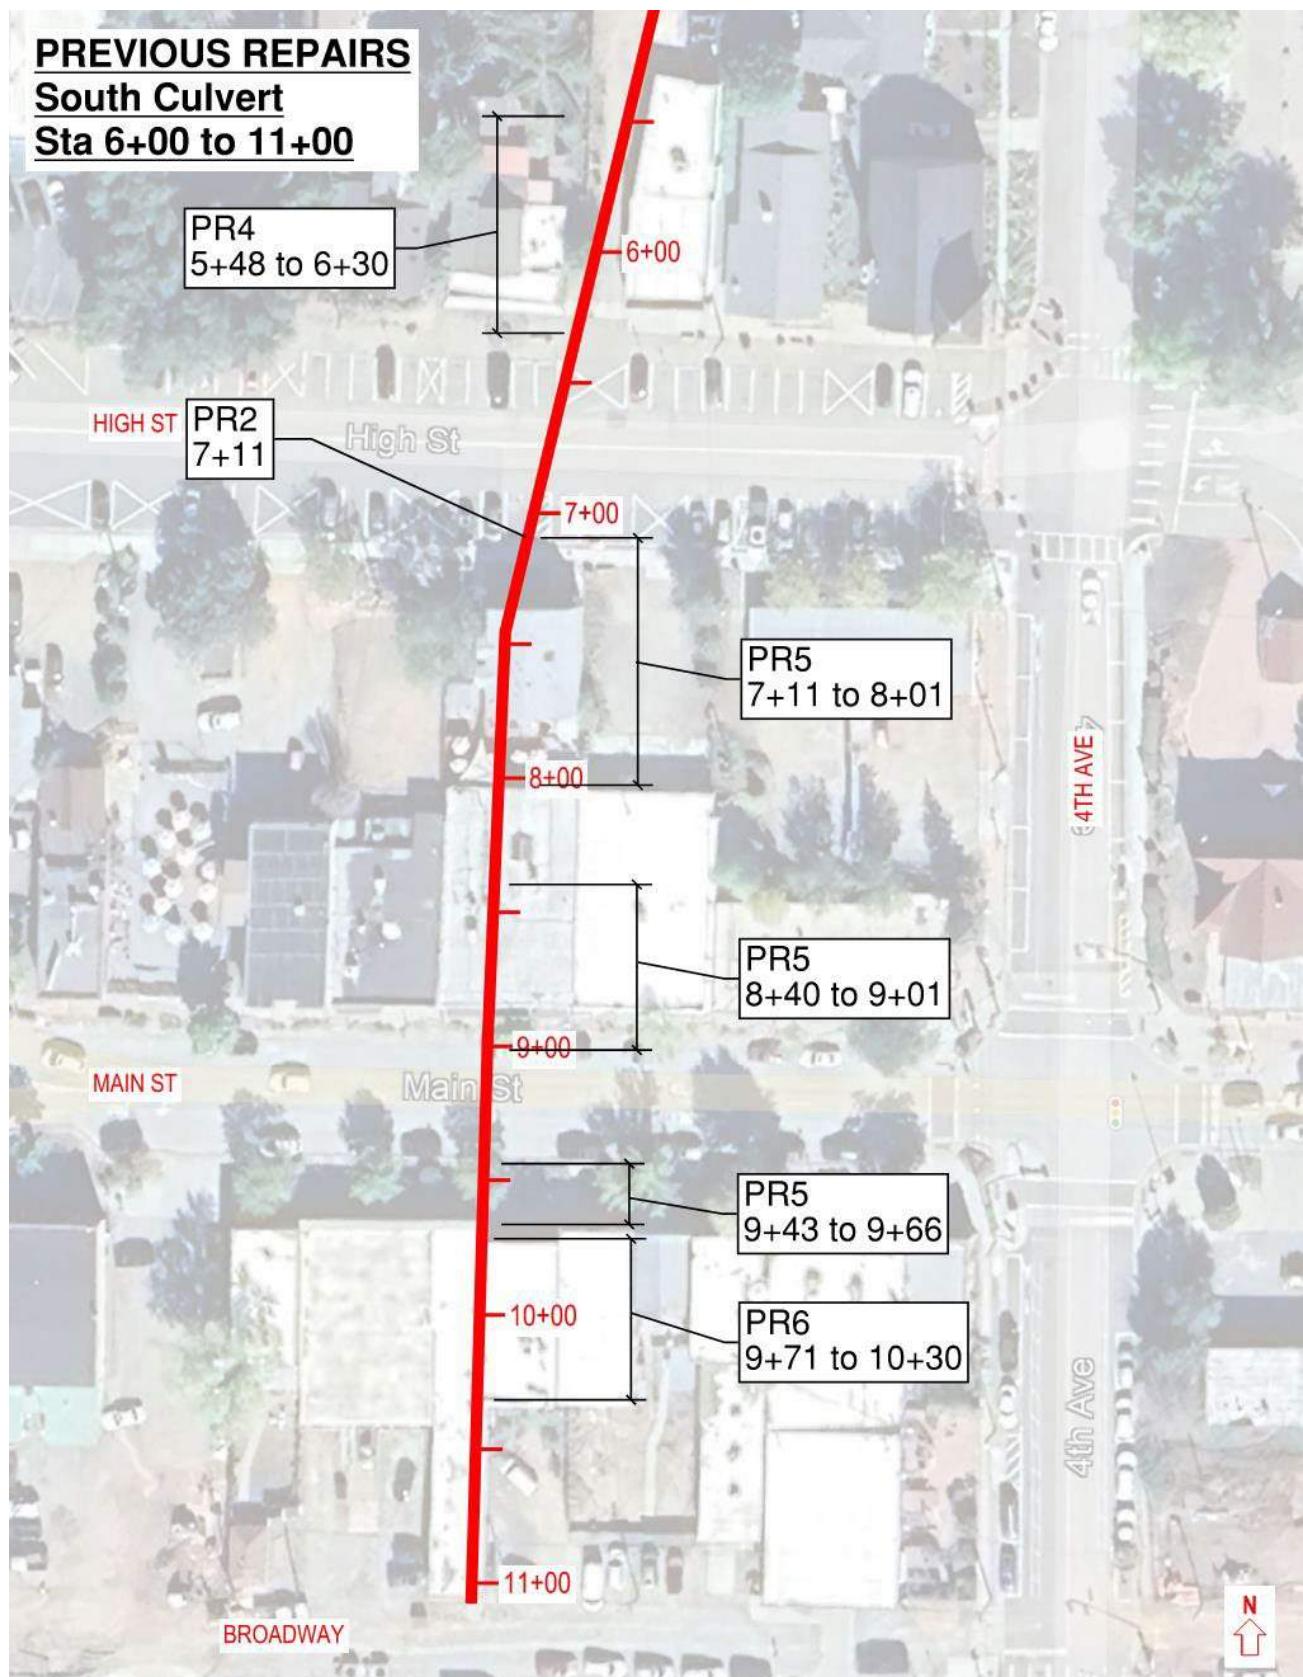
South Culvert Previous Repairs Stations (S)6+00 to (S)11+00
